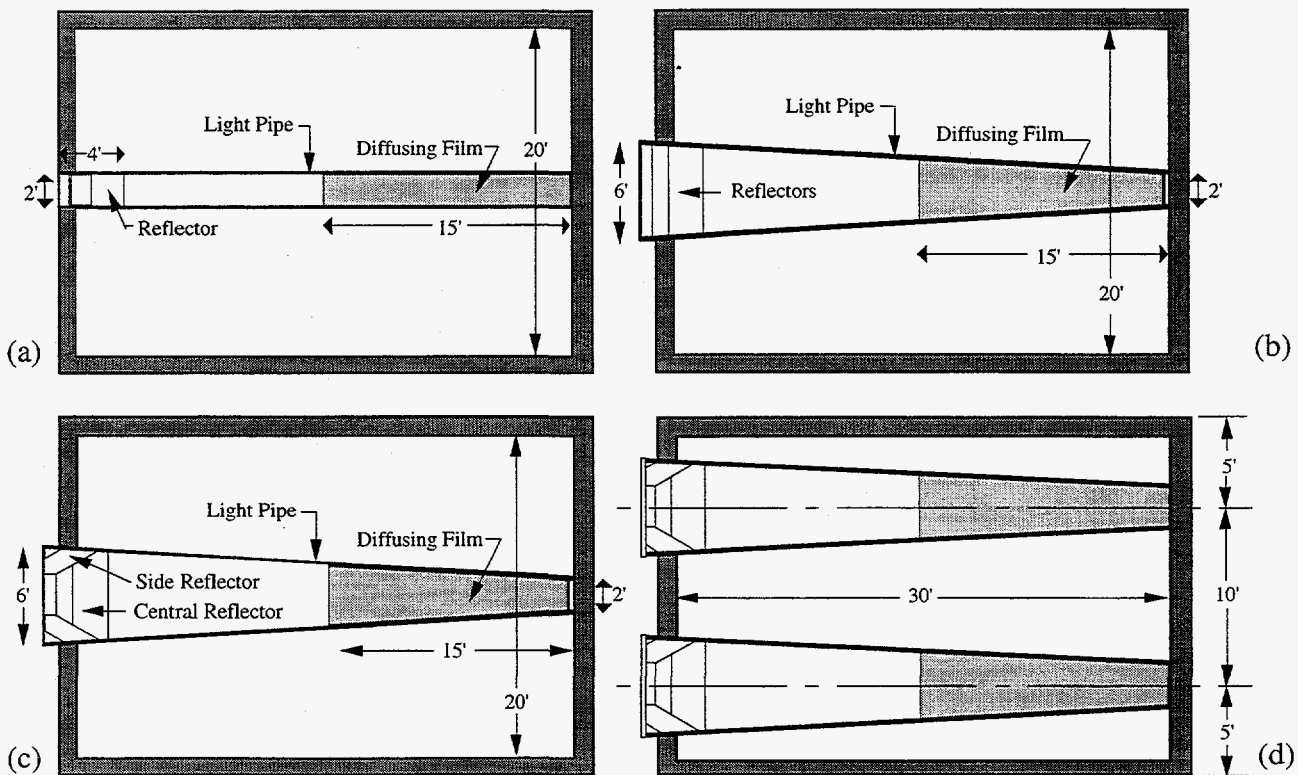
Floor plans of light pipe designs: (a) base case light pipe, (b) Light Pipe A: rectangular section light pipe with central reflectors, (c) Light Pipe B: rectangular section light pipe with side reflectors, and (d) Light Pipe C: trapezoidal section light pipe with side reflectors (location of two light pipes in space).
